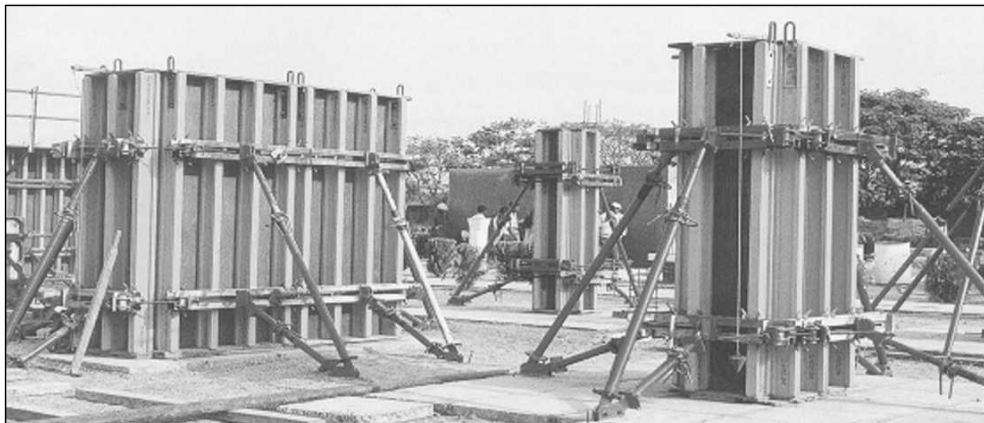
Mock-up to Explain the Wall and Column Formwork.
